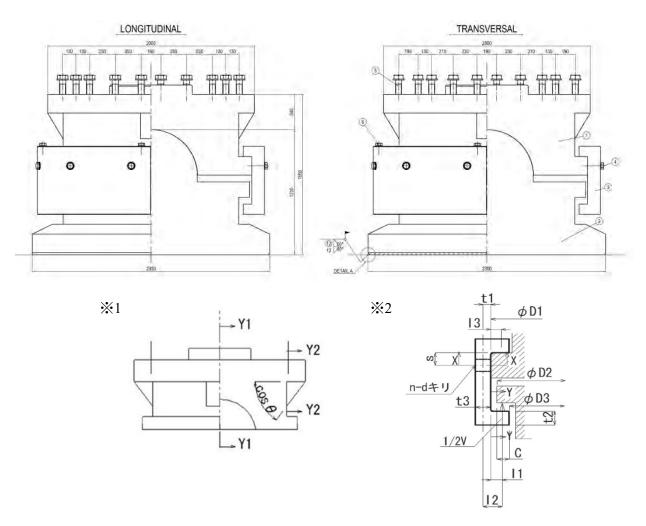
Pivot Bearing Overview and Cross Section Location
